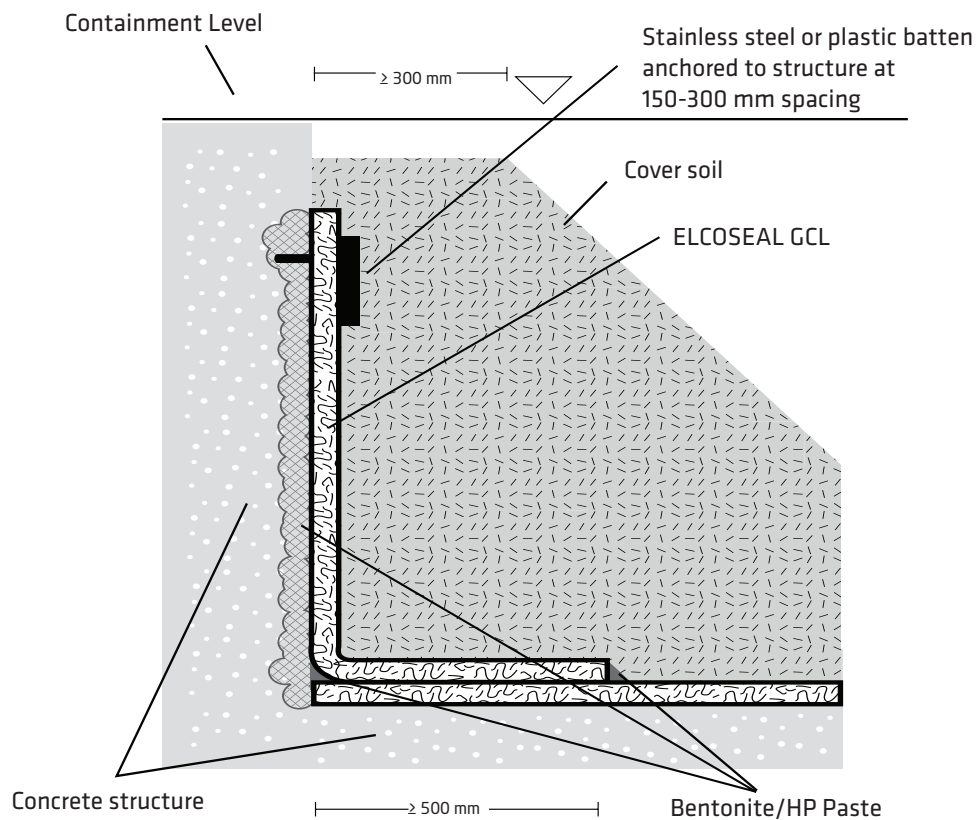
Typical connection to a concrete structure where the ELCOSEAL panel if required to extend below the maximum containment level
